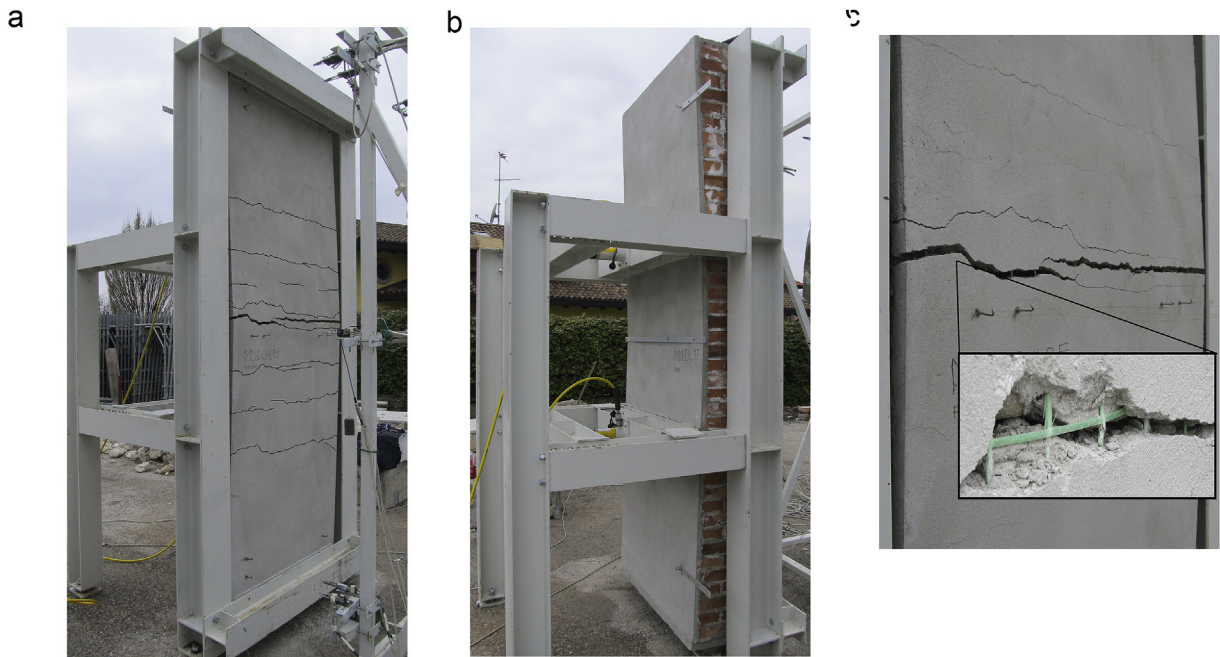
Typical crack pattern of RM samples at the end of the bending tests: global views of (a) tensed and (b) compressed wall face and (c) detail of the GFRP wires rupture.
